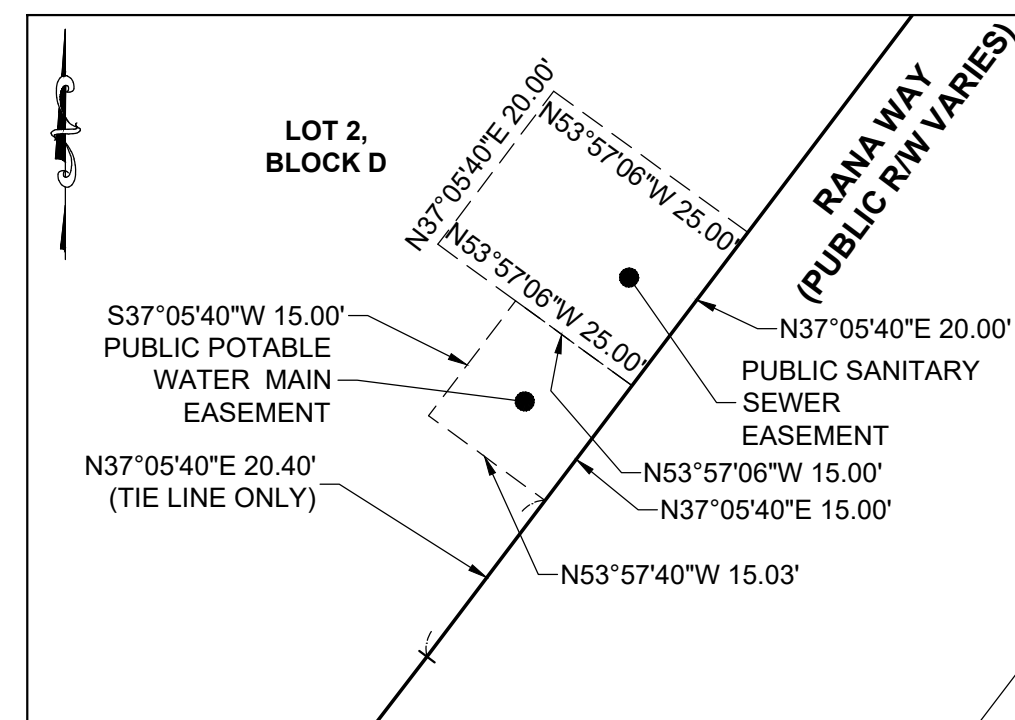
DETAIL E, PUBLIC SANITARY SEWER EASEMENT (SEE SHEET 11)
